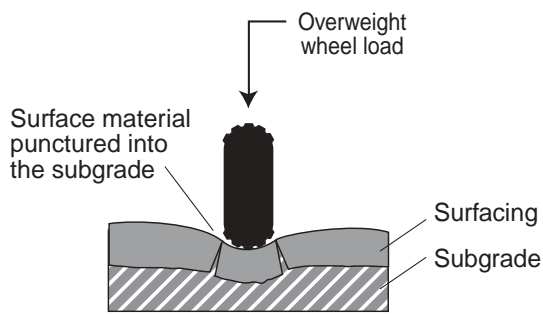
Shear failure of a road surface because of overweight wheel loads.
